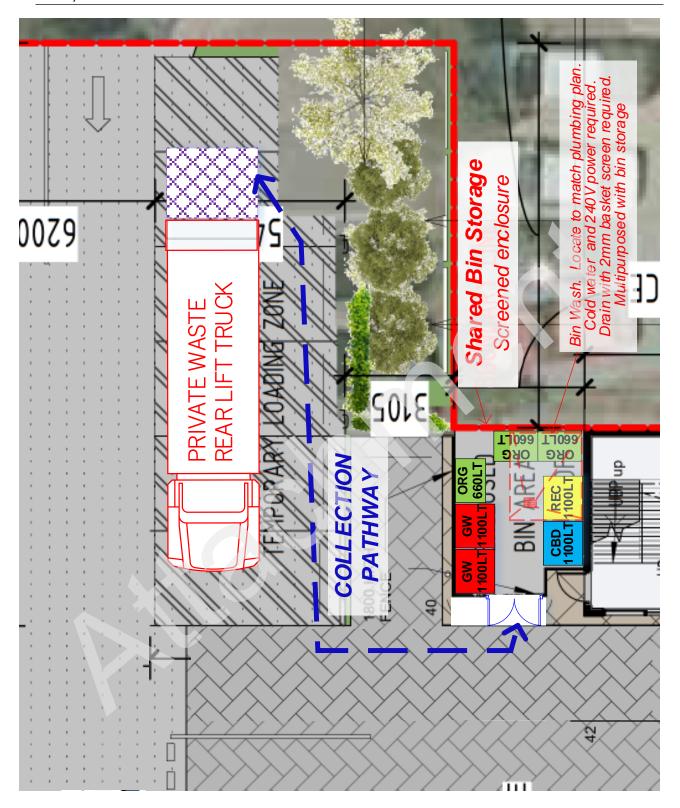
Detailed view of waste storage and collection. GW=General Waste, REC=Mixed Recycling, ORG=Organics, CBD=Cardboard.
